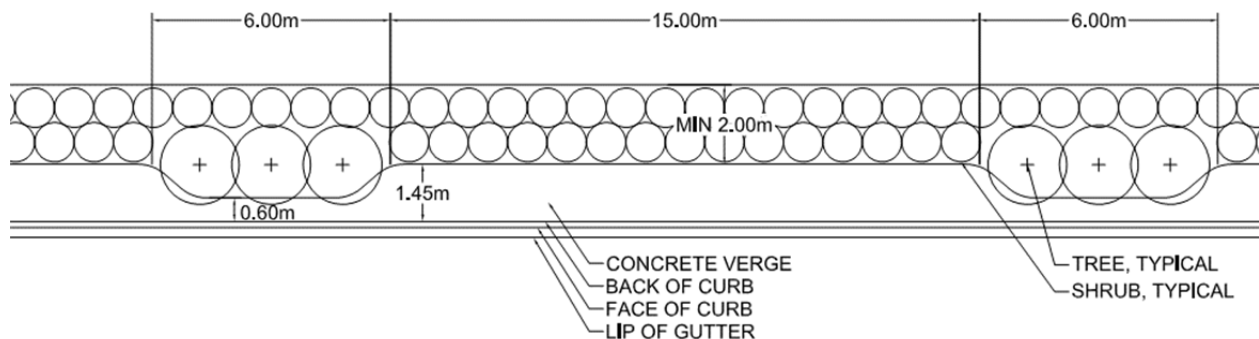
Trackway Boulevard Landscape Area in Avonmore
